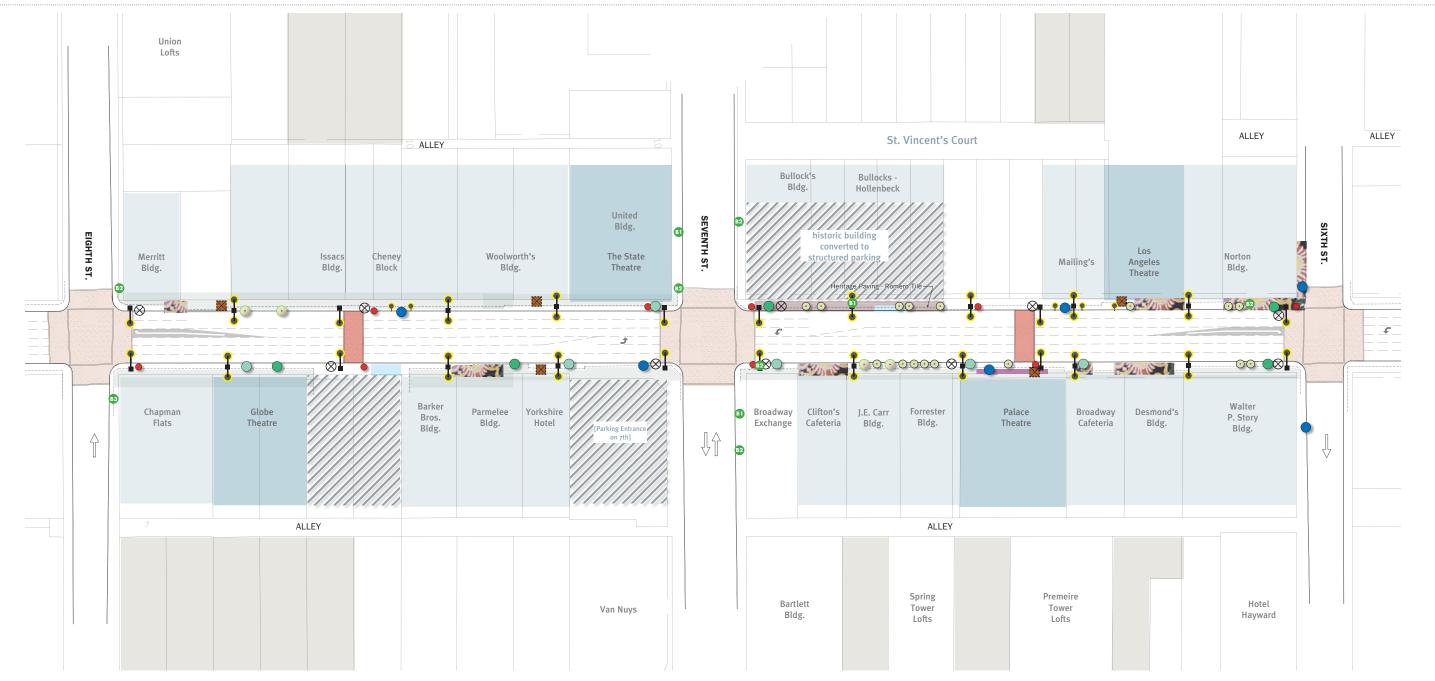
2009 Existing Conditions Plan - Broadway from 6th Street to 8th Street
